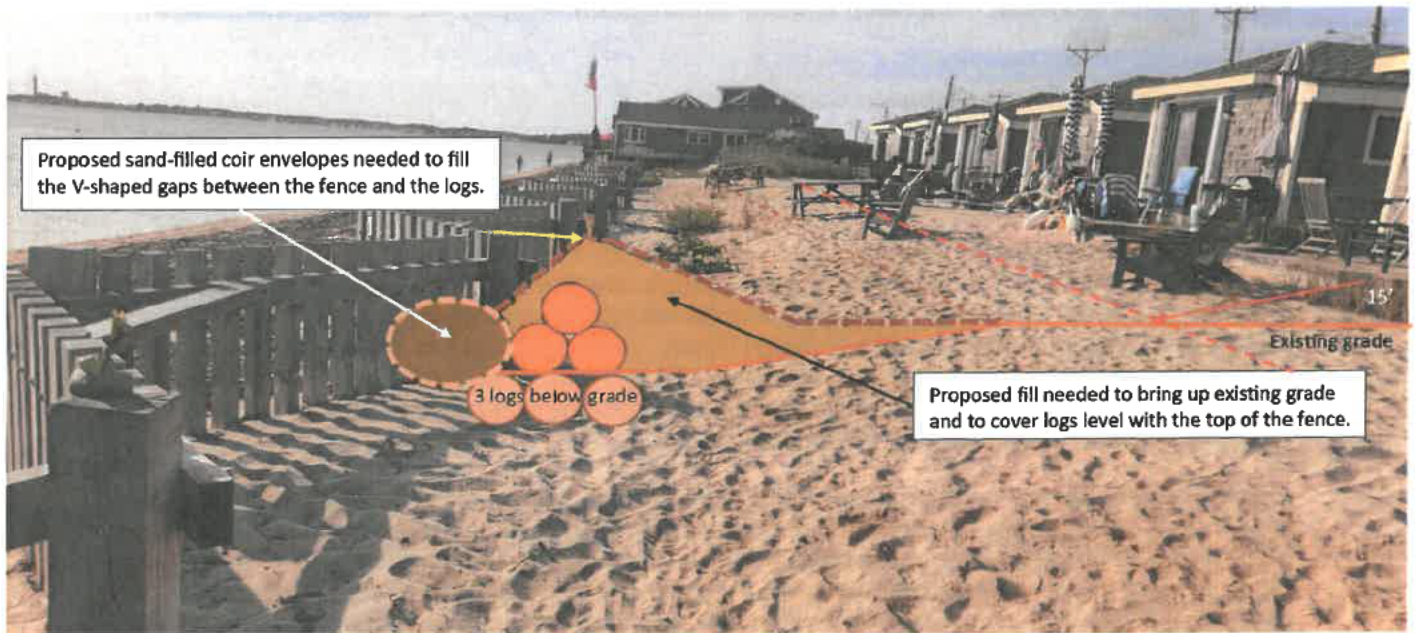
Detailed cross-section of the three proposed components of restoring and protecting the Primary Frontal Dune: 1) coir envelopes; 2) coir logs; and, dune nourishment planted with beach grass.
